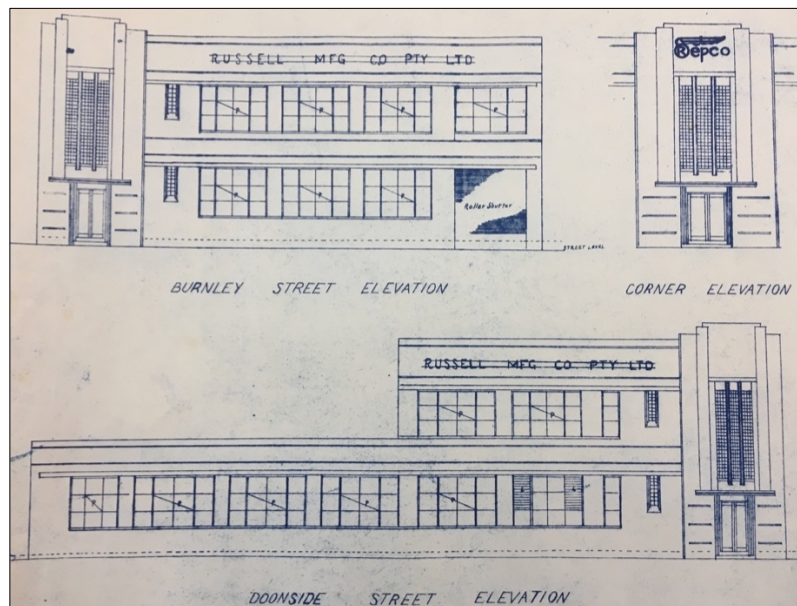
Undated (c1942) architectural drawings for the Repco building on the corner of Burnley and Doonside Streets. Source: Public Record Office Victoria.
